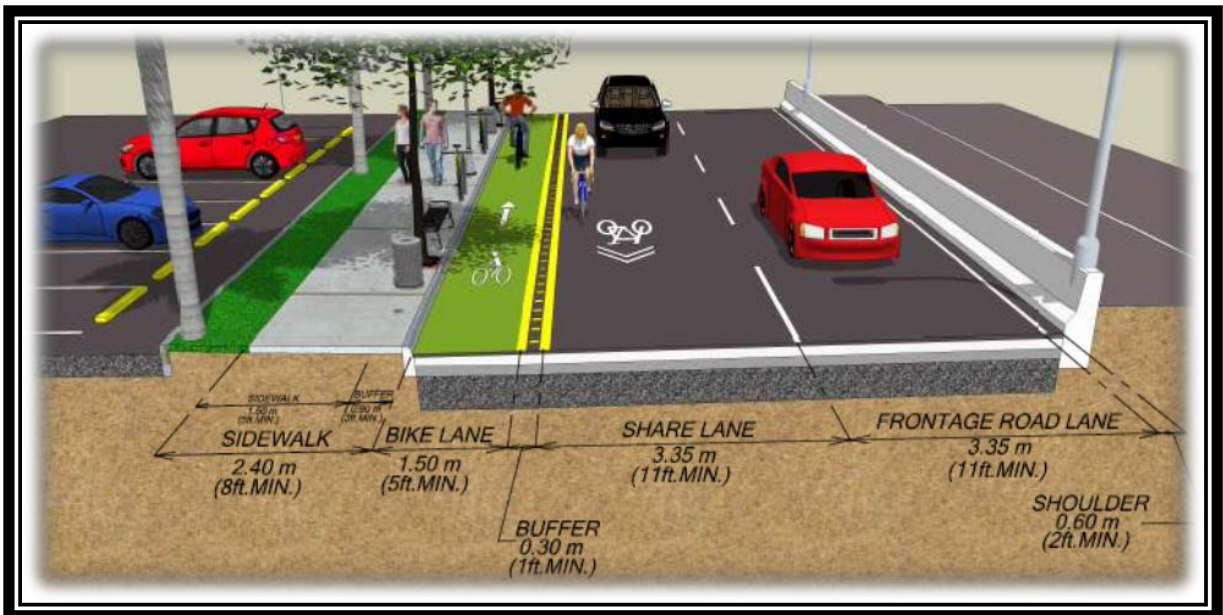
Figure Q – Highway PR-2 (University Plaza Frontage Road).
